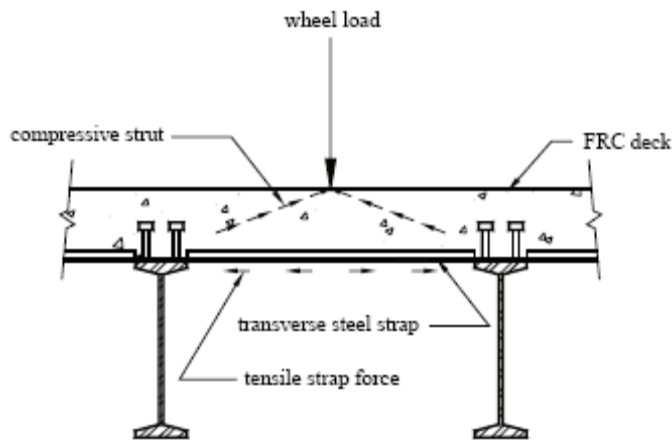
Fiber Reinforced Concrete (FRC) Bridge Deck Cross-Section
